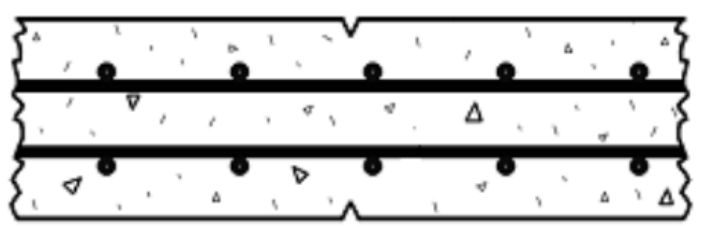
Construction Joint with Continuous Reinforcement (ALDOT 2010)
